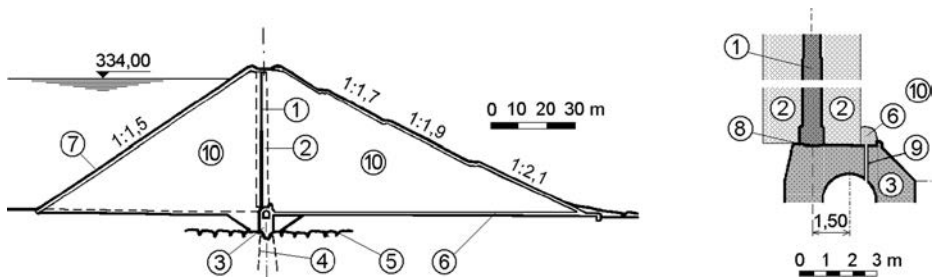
Megget dam (Scotland) with detail of the joint of the asphaltic concrete core and the foundation (after Gallacher, 1988). (1) Asphaltic concrete core; (2) transition zone; (3) inspection gallery; (4) grout curtain; (5) firm rock; (6) filter material; (7) stone lining; (8) asphaltic mastic; (9) drainage pipe; (10) gravel embankment.
